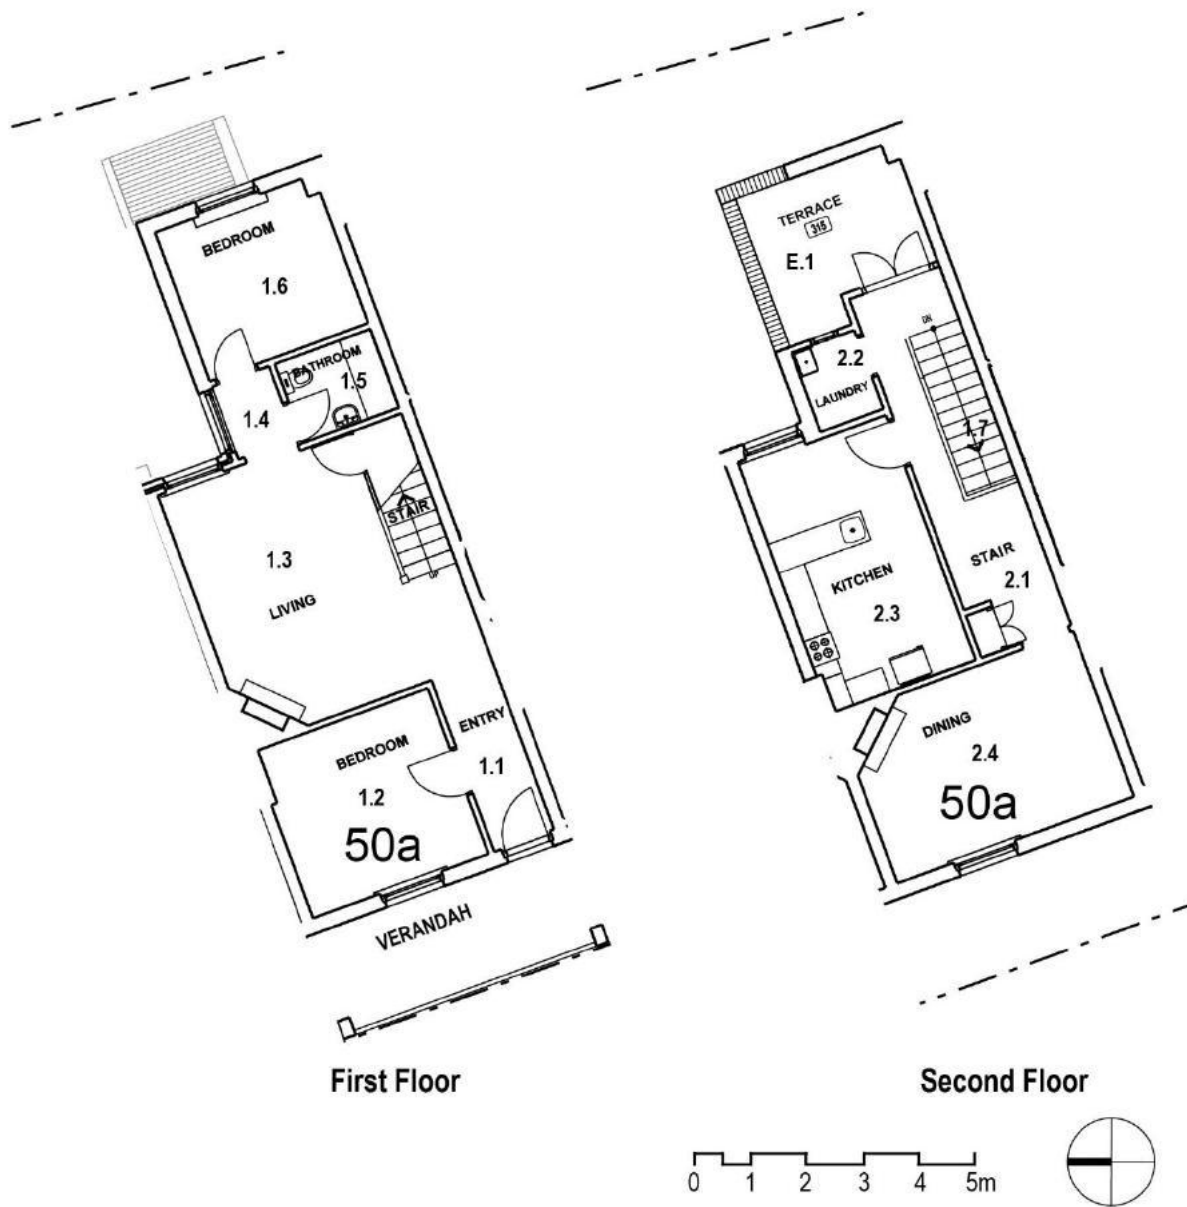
Floor plans of Flat 50A / 46–56 Gloucester Street showing layout of flat and space numbers, for the first and second floors. (Source: LAHC, with GML overlay 2016)
